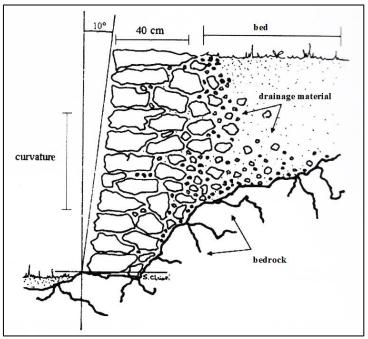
Terrace wall scheme, from Caneva and Cancellieri (2007).
